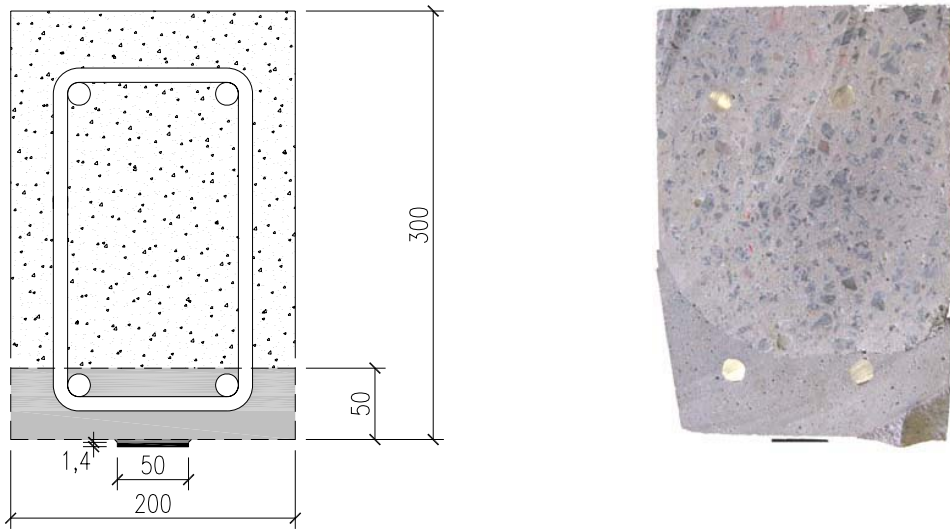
Left: Schematic of repaired and strengthened beam cross section. Right: Real cross section of repaired and strengthened beam.
